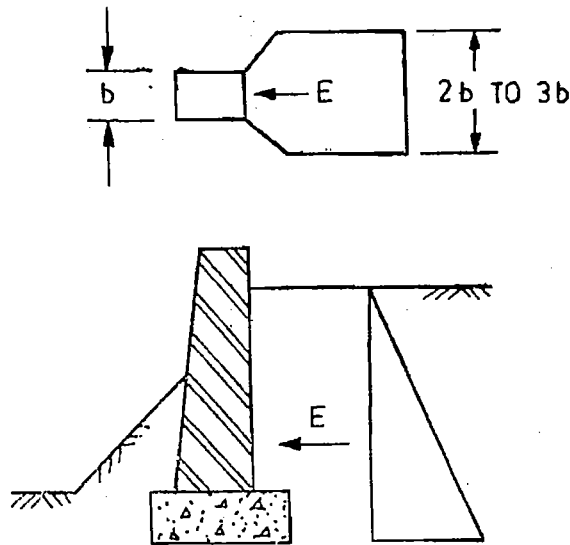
SKETCH SHOWING EFFECTIVE WIDTH OF PILLAR FOR CALCULATING SOIL PRESSURE
